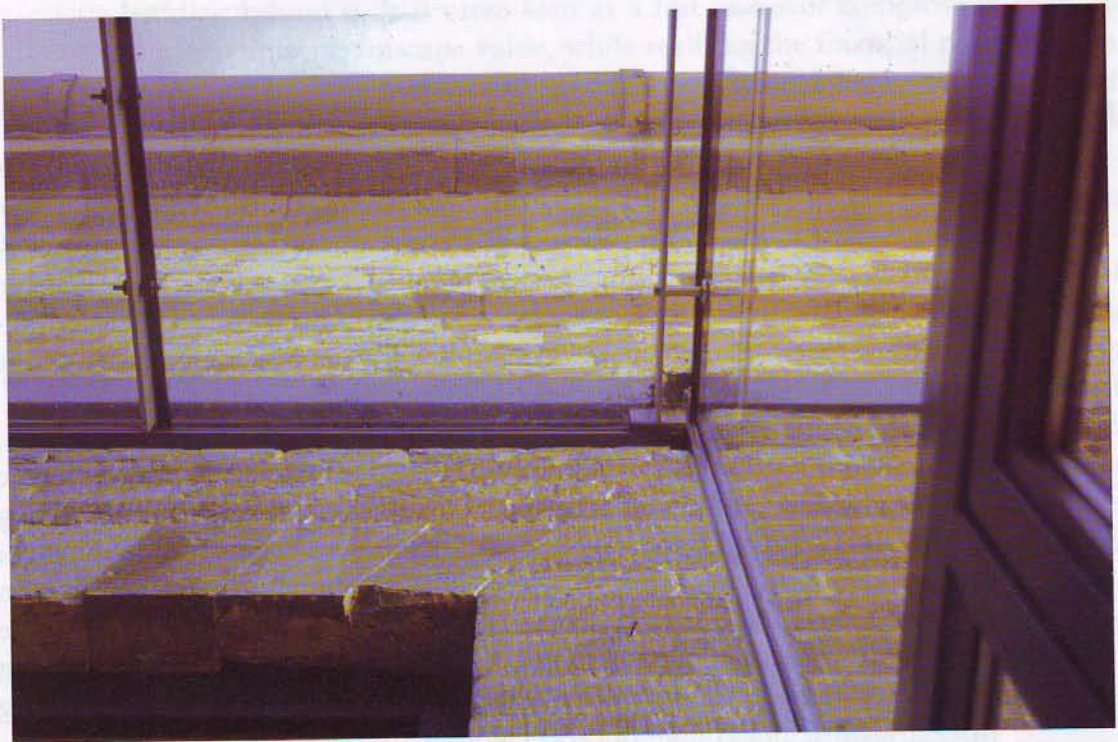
A carefully considered detail between the existing building and new extension at Compton Verney by Stanton Williams Architects.
